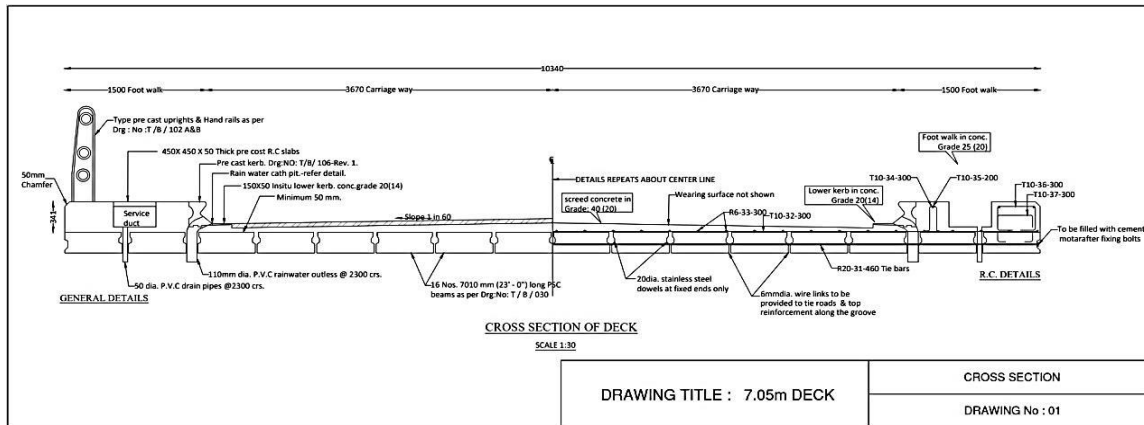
Two lane solid slab deck. 7.085m (smallest length) cross section
